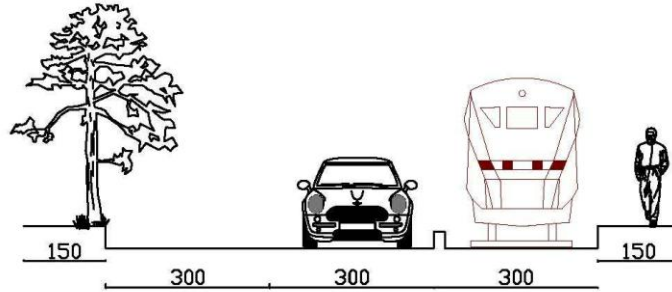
Section of Proposed District Distributor (Cahit Sitki Taranci Street, Ziya Gokalp Street, 9 Mart Street, and Ibrahim Hasan Street)
